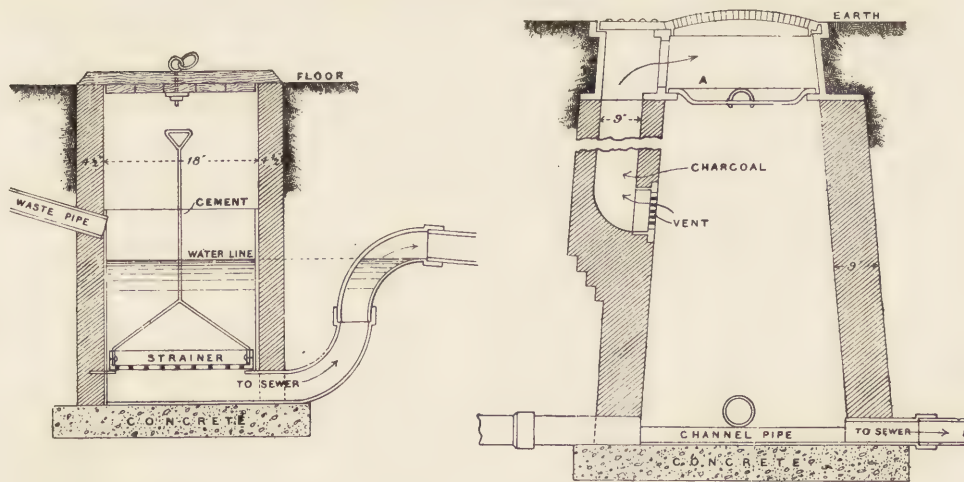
GREASE-TRAP CONSTRUCTED IN BRICK AND CEMENT.
